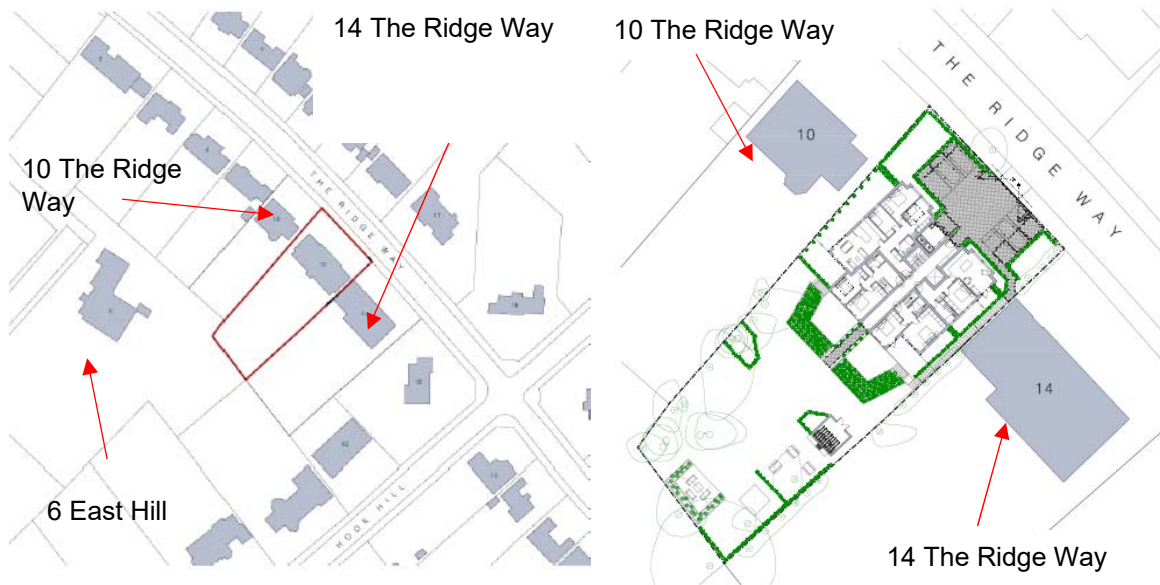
Site Plan highlighting the relationship with the adjoining occupiers (Left – Existing, Right – Proposed).
